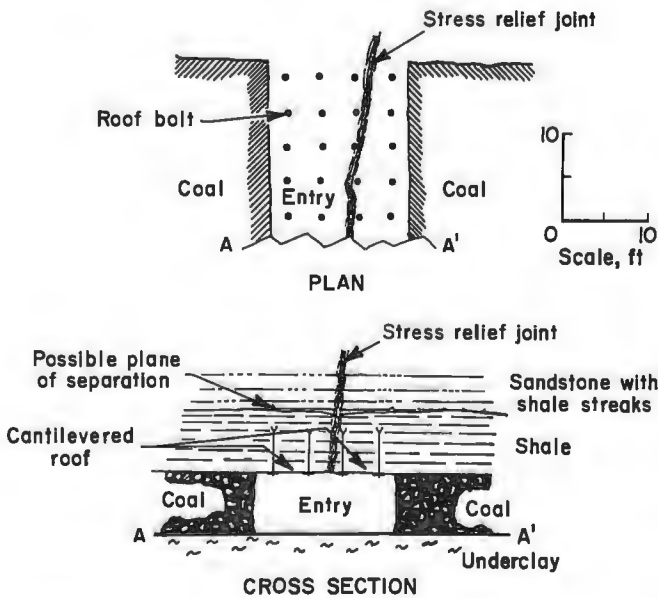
Plan and cross section views of cantilevered roof failure caused by stress-relief joint paralleling development.
